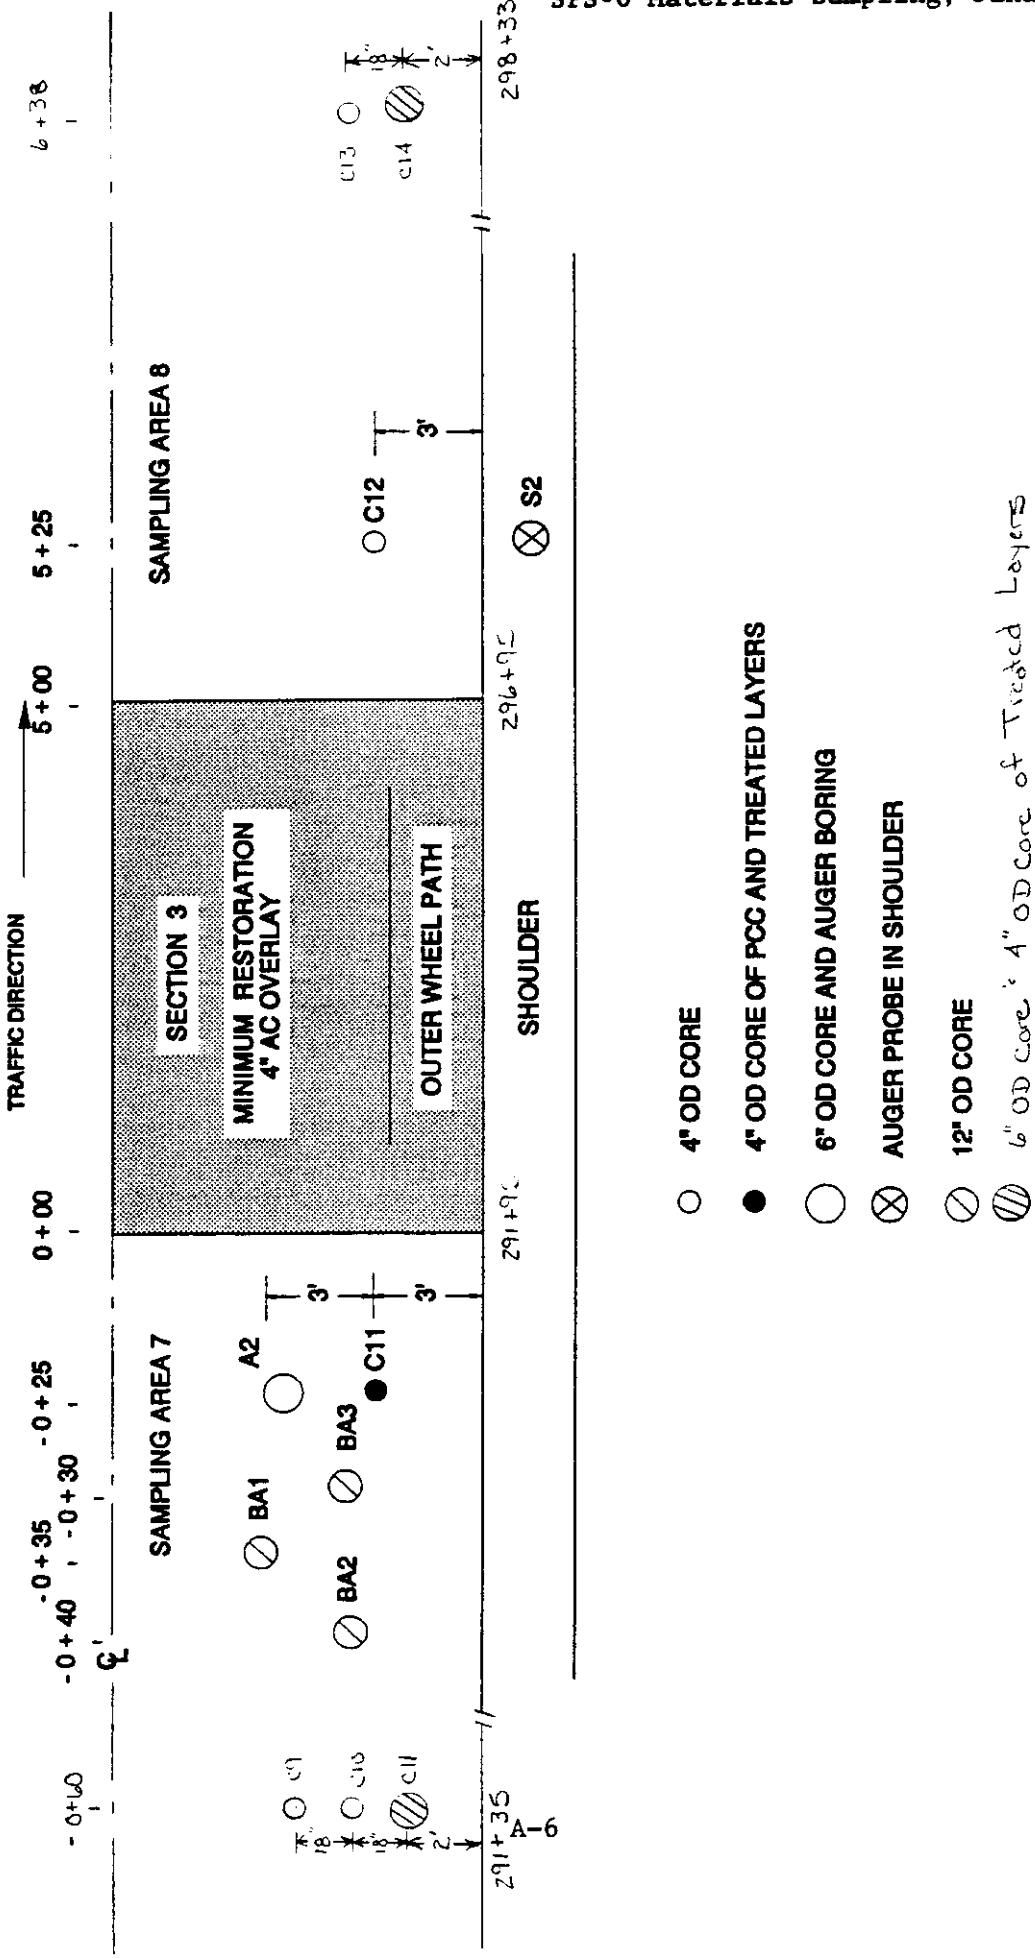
Example of "Pre-Construction" Sampling Plan for Test Section 3
